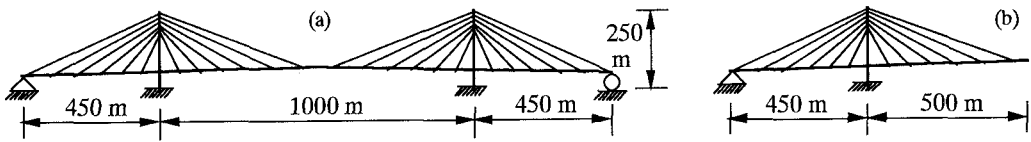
Modeling of studied bridges: (a) a completed bridge, (b) a half-span bridge during erection
